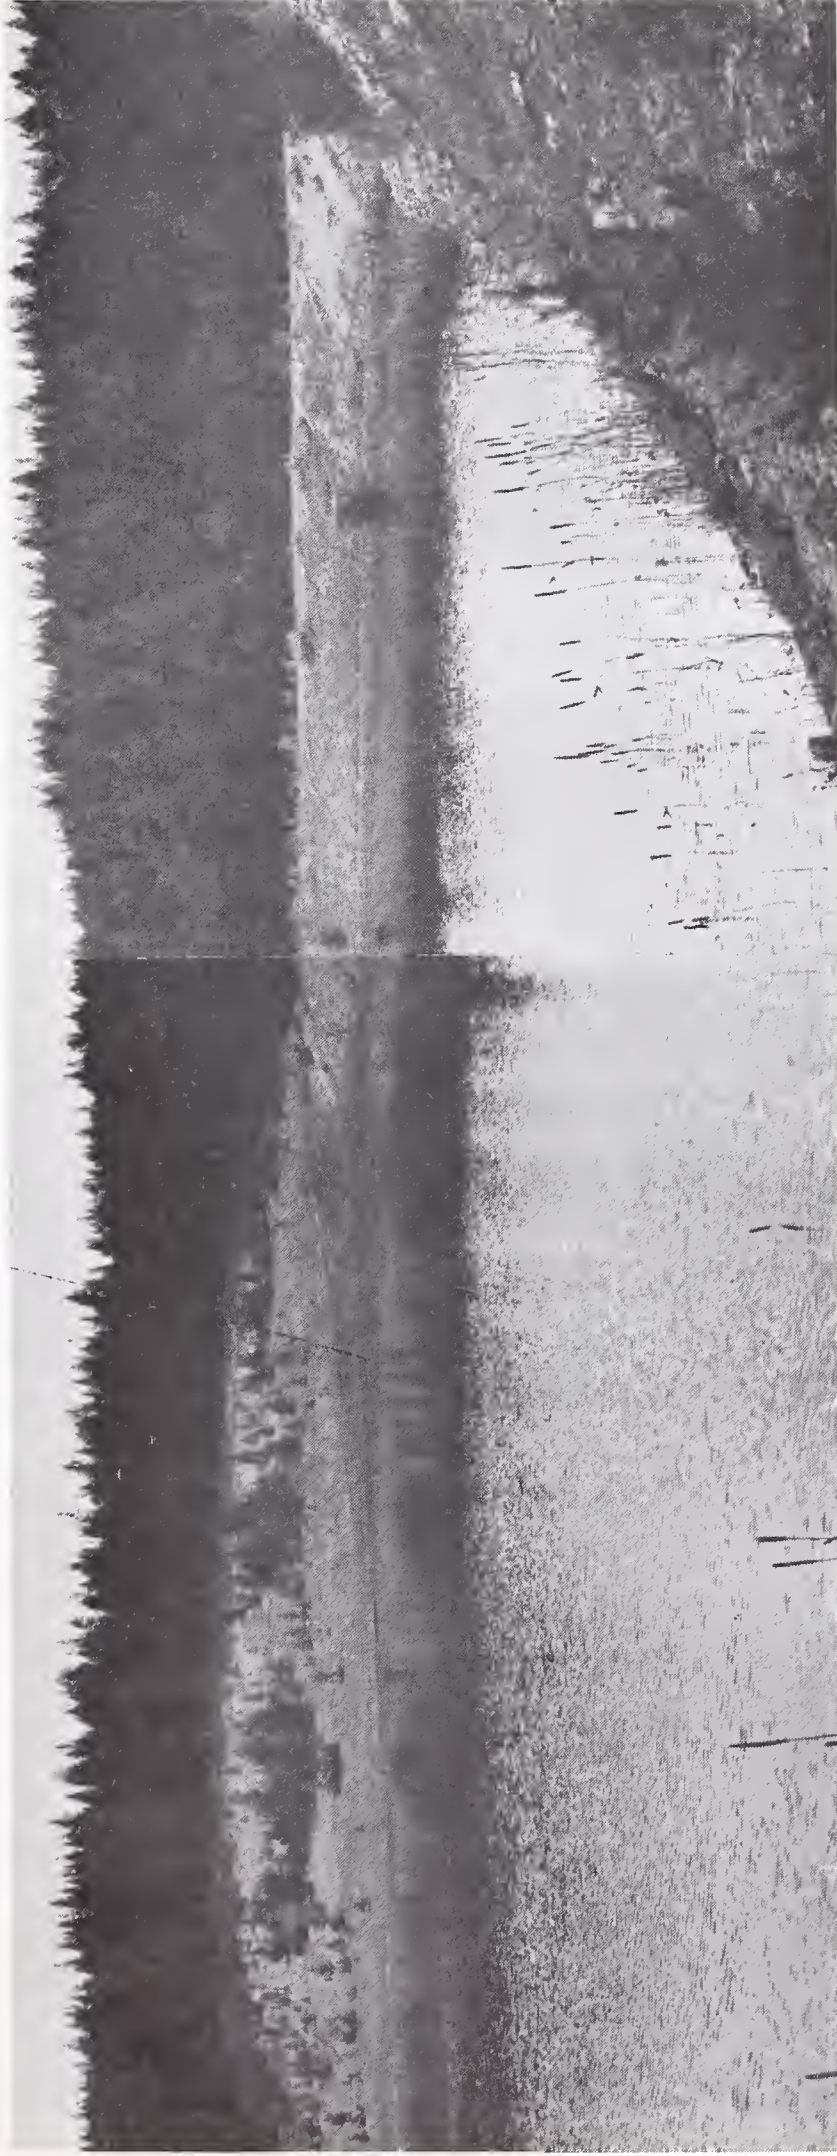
Upstream slope of Dam looking toward south abutment and spill-
